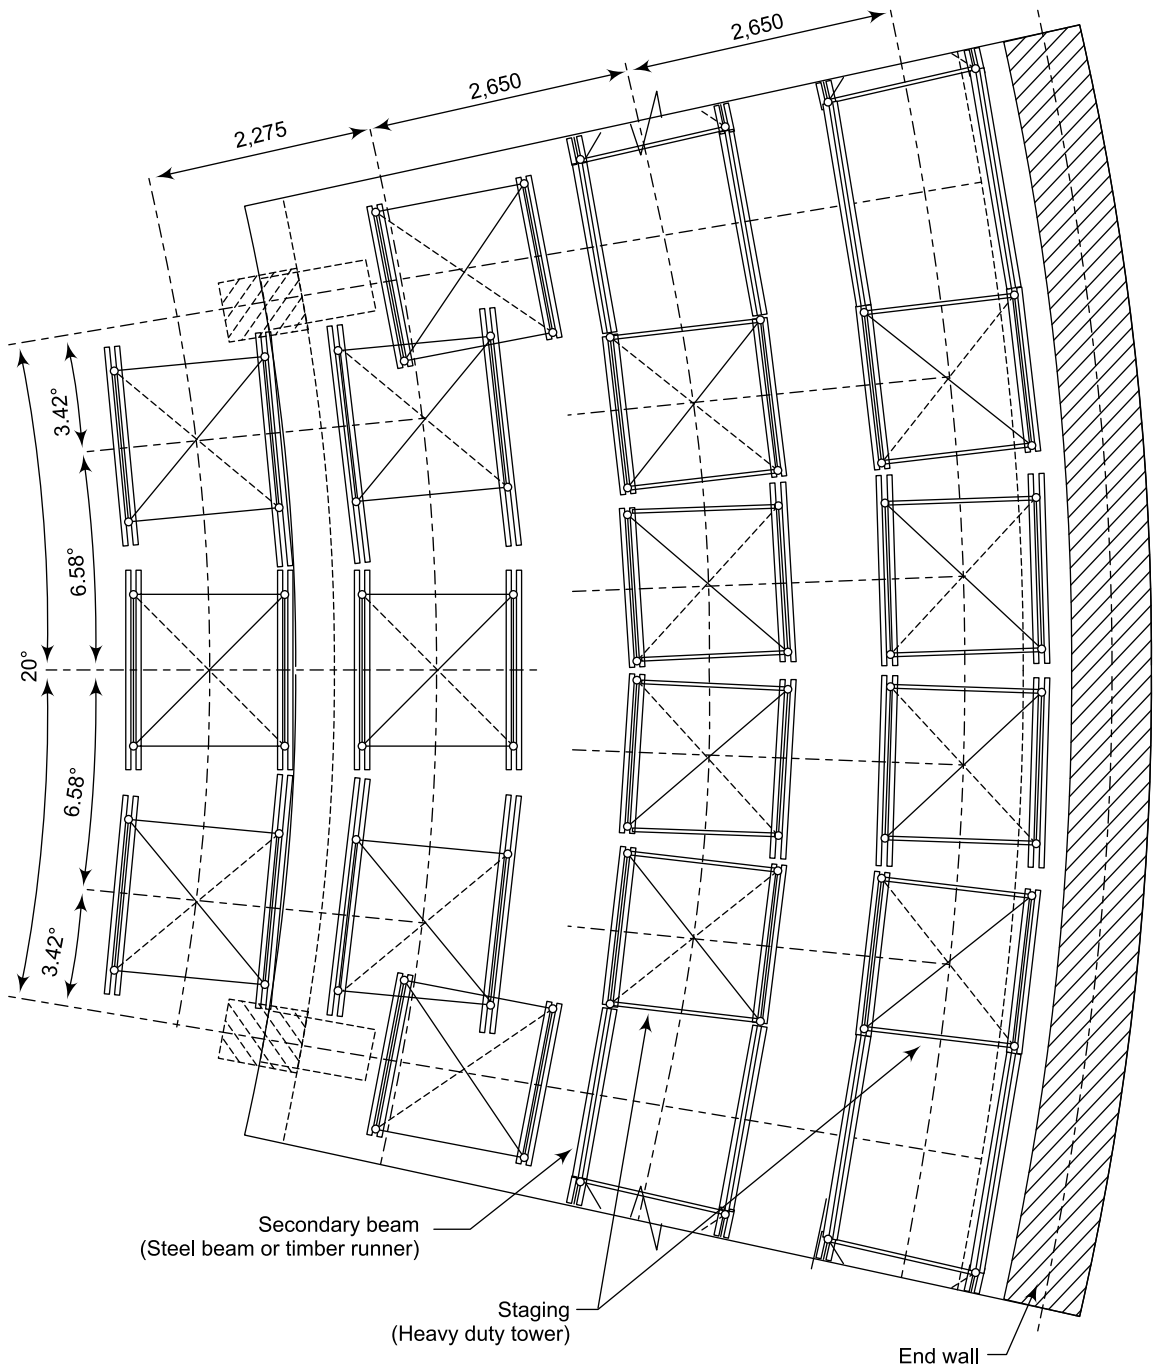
Part Plan Showing Shoring Arrangement and Secondary Beam.
